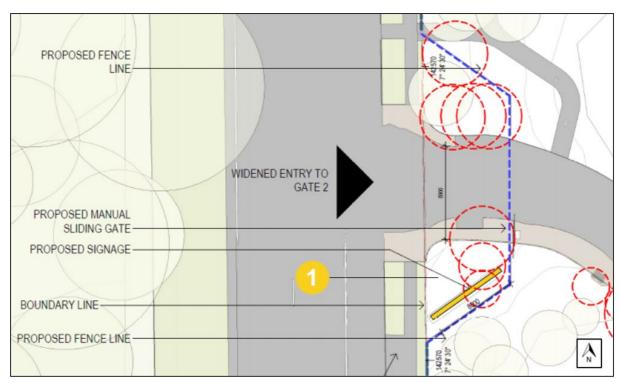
| Gate 2 (O'Connell Street) driveway access widening (Source: Applicant's SRtS)
